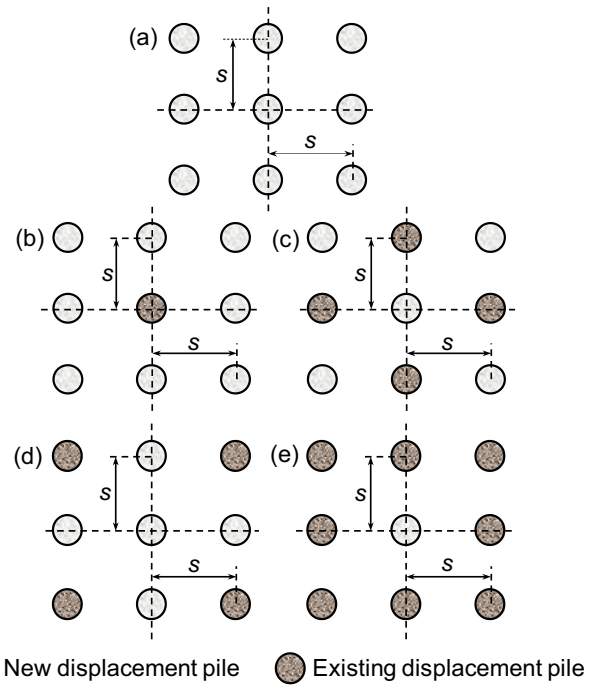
Layout of pile group consisting of new and existing displacement piles: (a) all new piles; (b) existing pile at the center; (c) existing piles at the edges; (d) existing piles at the corners; (e) new pile at the center.
